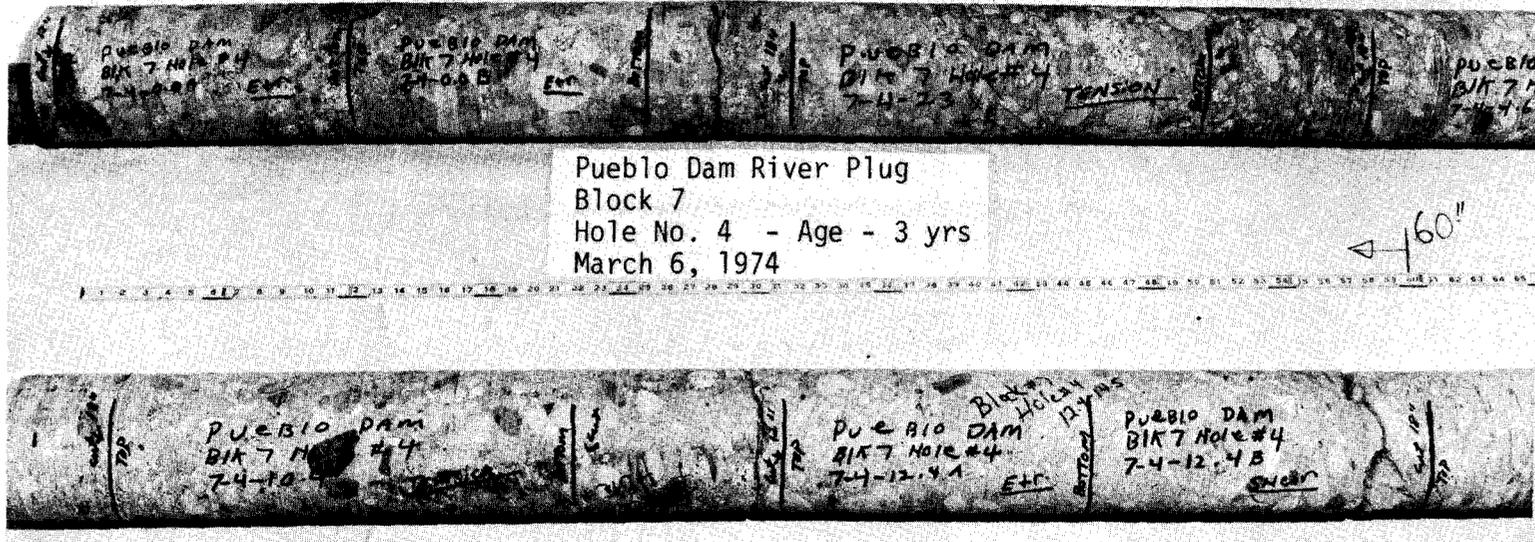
Typical concrete core sample marked for cutting. Note good consolidation at construction joint. Photo C-8327-36
